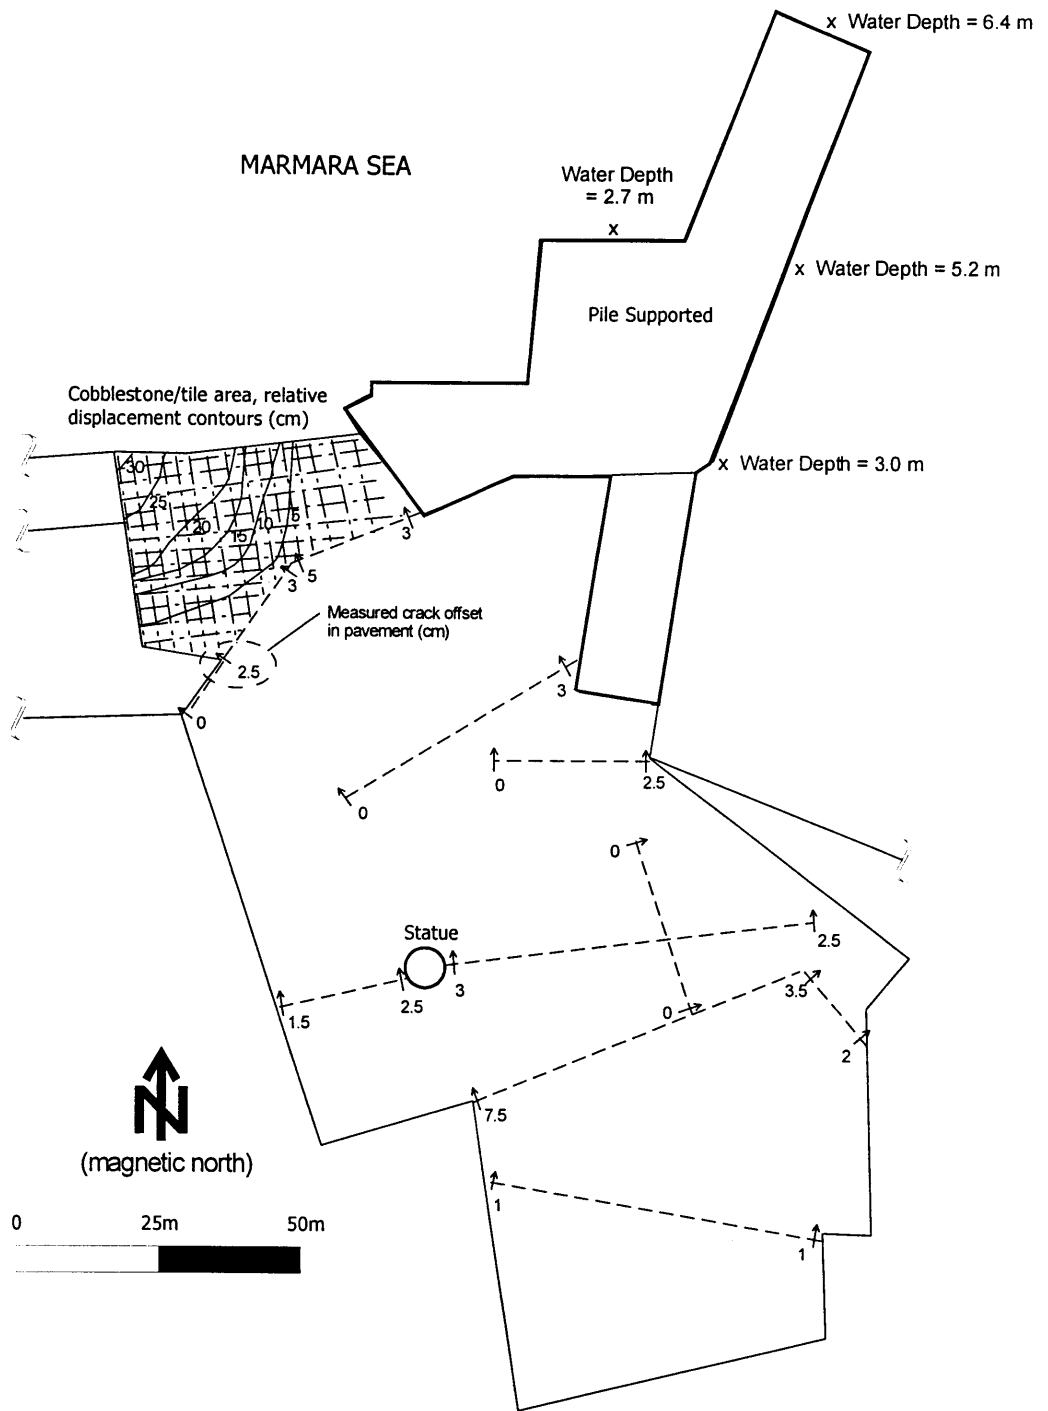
Sketch of parking lot and pier at Yalova Harbor
